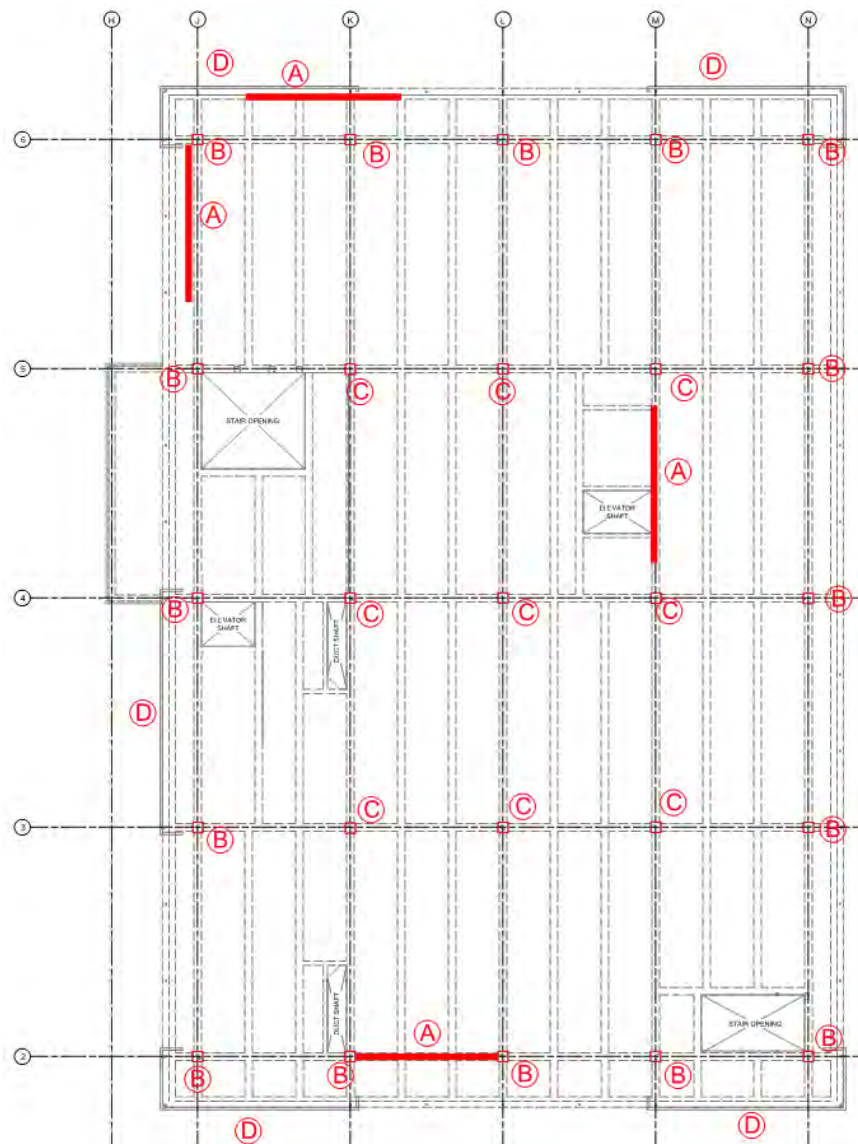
Typical floor plan at Courthouse indicating: A=proposed locations of retrofitted shear walls; B=exterior concrete columns; C=interior concrete columns; D=exterior precast concrete façade panels
